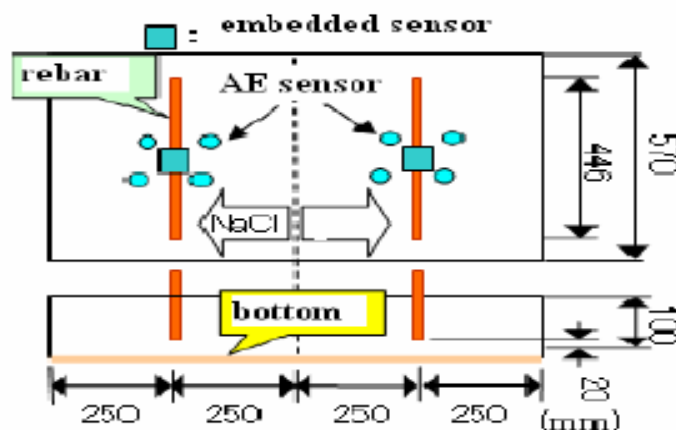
Sketch of reinforced concrete slab tested (Ohtsu et al., 2010)
